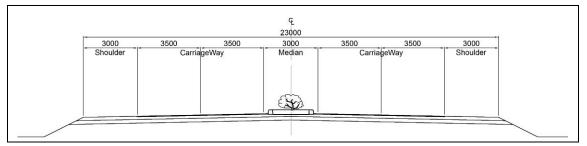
Typical Cross Section of Pursat Bypass
